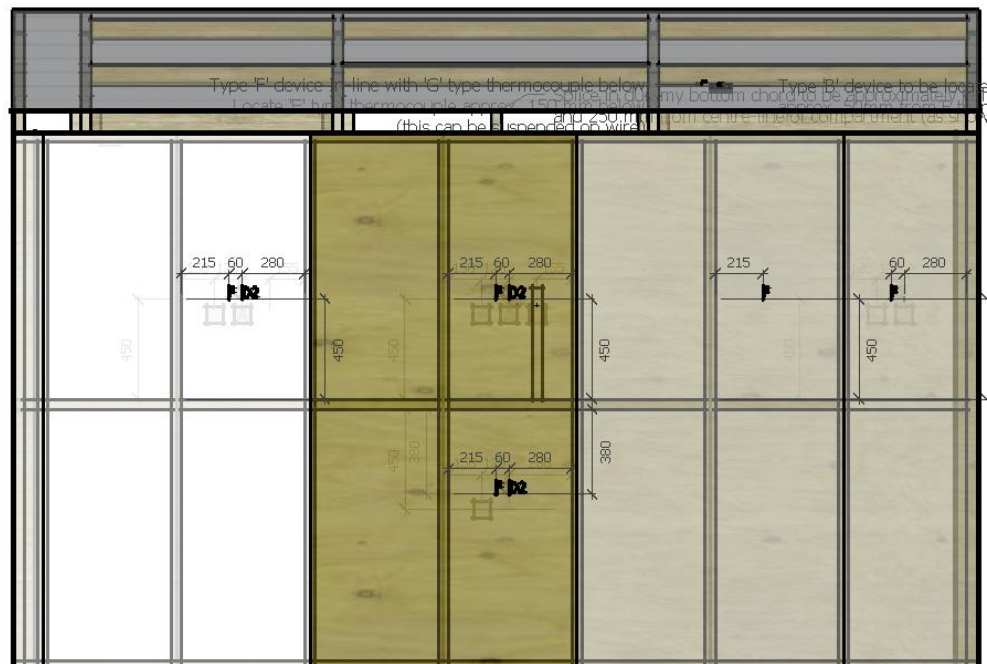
Experiment #2 general layout of thermocouples on non-rated long wall cladding (viewed from outside)
